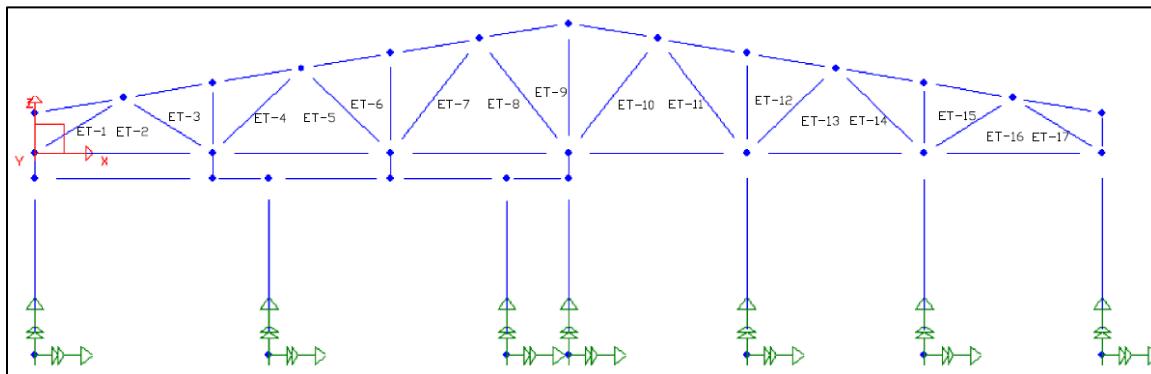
Exterior Truss, Gridline B, S-Frame Model Showing Member Numbers
